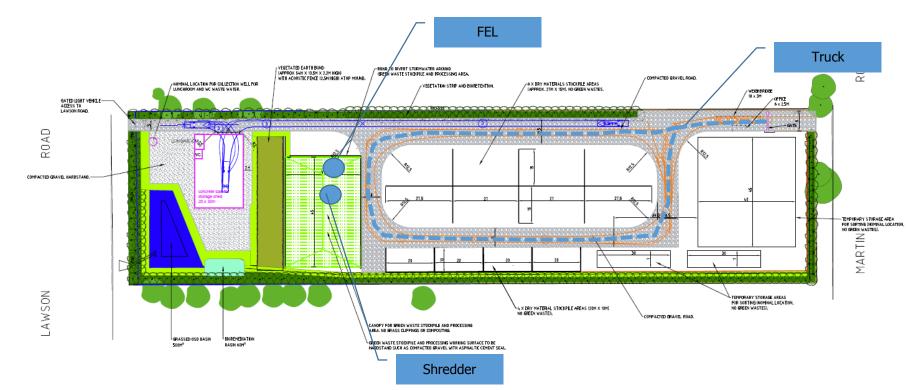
Site Plan showing Barriers & Source Locations – Scenario 3
